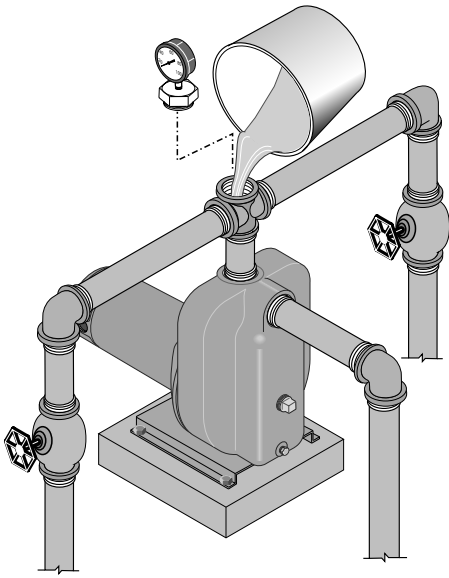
Remove Priming Plug. Fill Pump Before Starting
